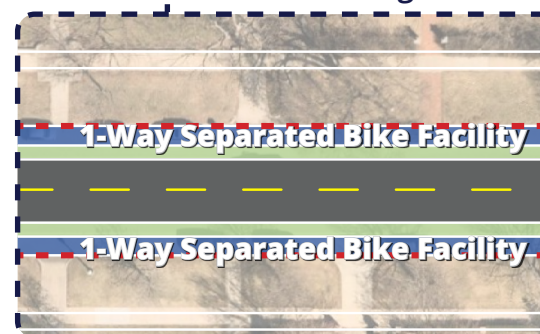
| Segment D, E, F - Proposed Concept - Typical Block
